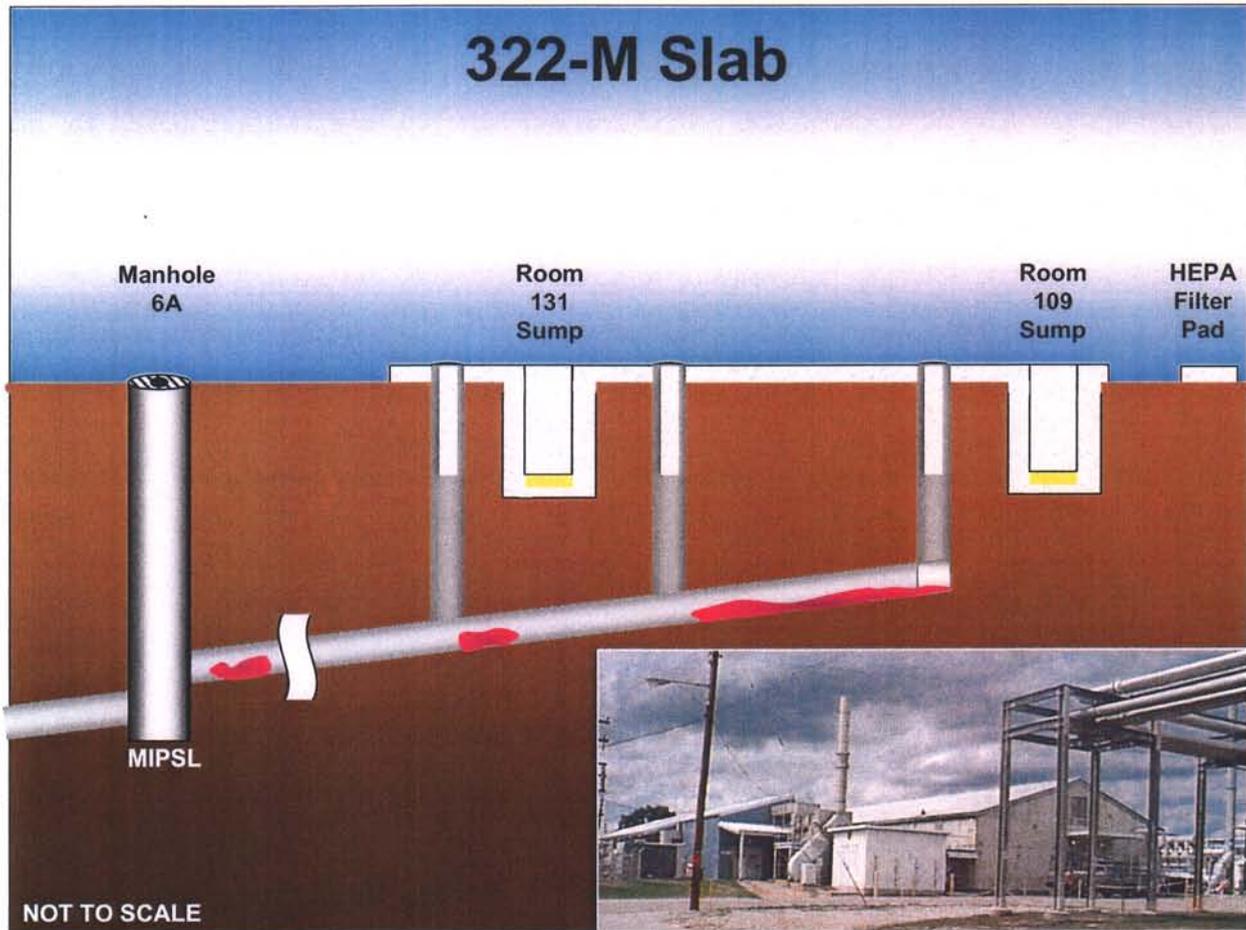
Schematic of Pipeline Network Under 322-M Slab to Manhole 6A
